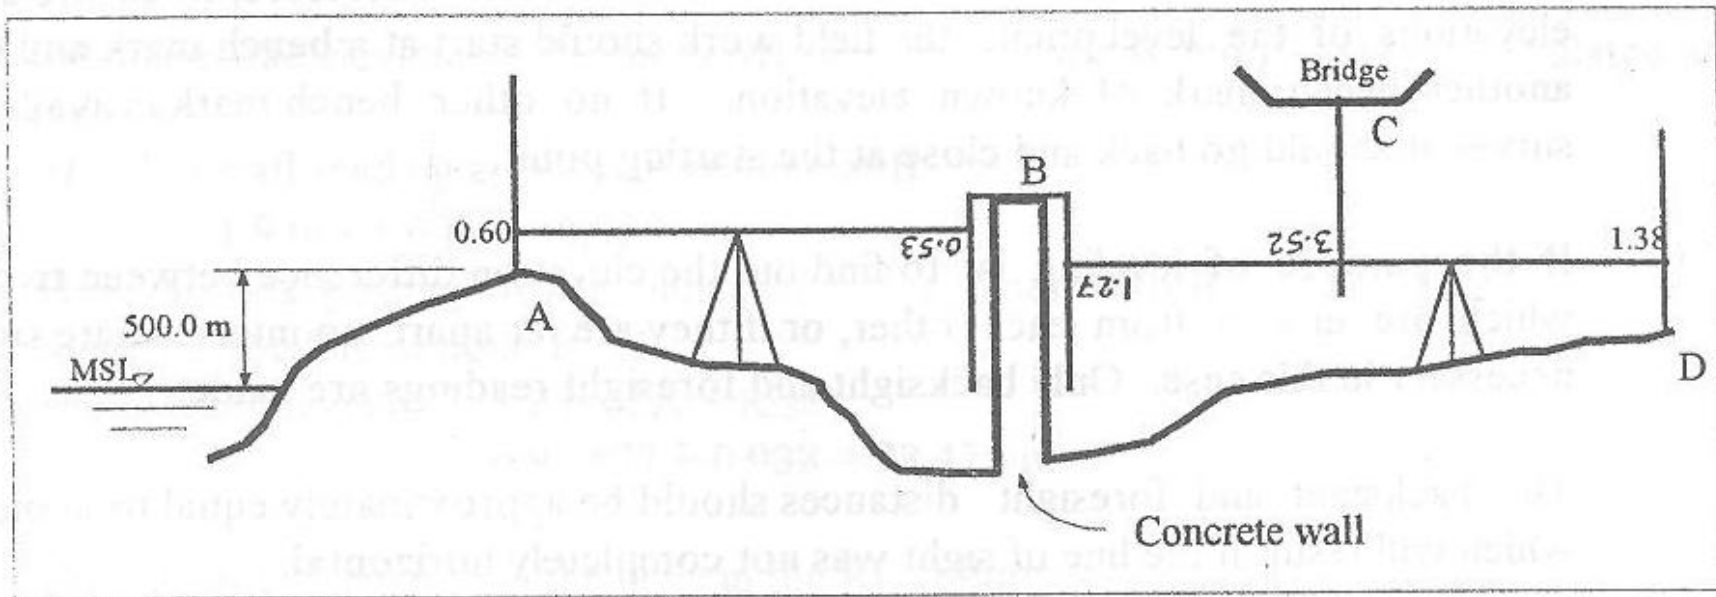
A leveling chain with a bridge and a concrete wall obstacle.
